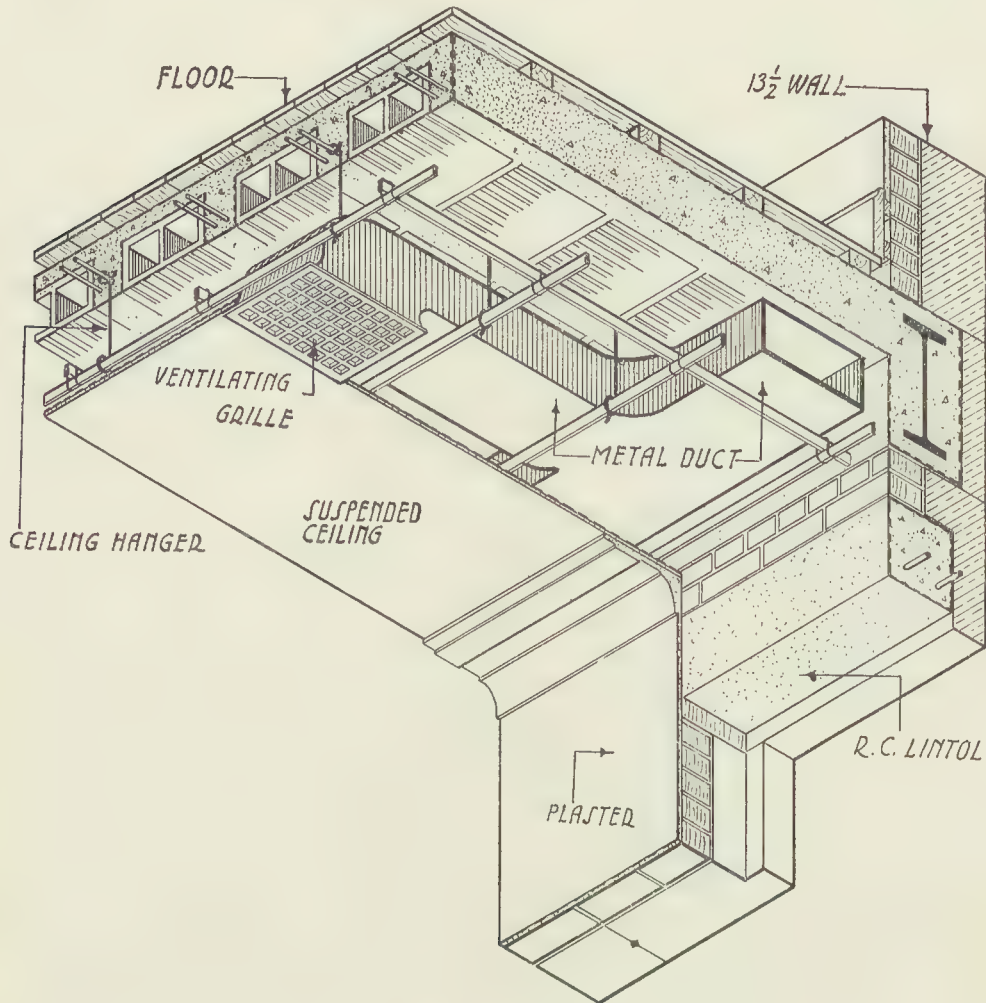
HOUSING VENTILATING DUCTS UNDER FLOOR SLABS
